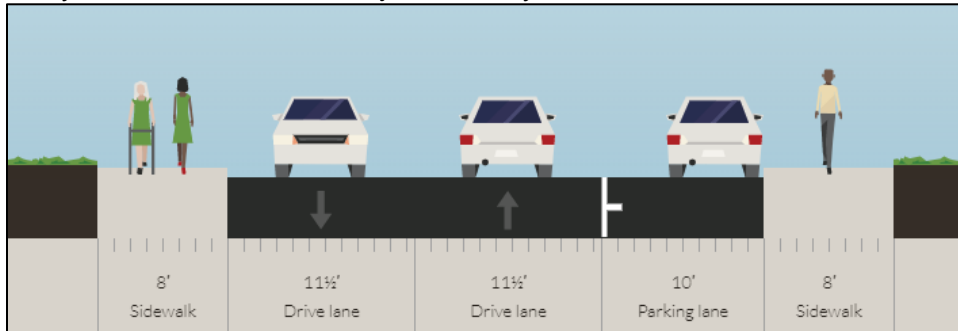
21<sup>ST</sup> AVE. TYPICAL SECTION
